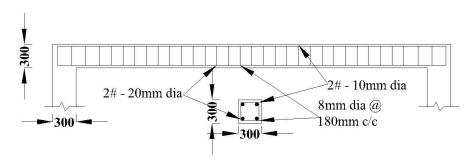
Reinforcement detial of plinth beam (longer span)
